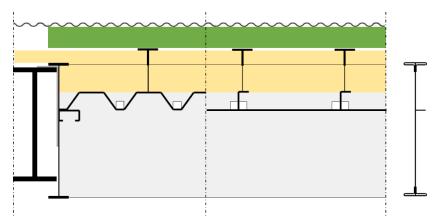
Horizontal section of the façade element (alternative 1 on the left, alternative 2 on the right)
